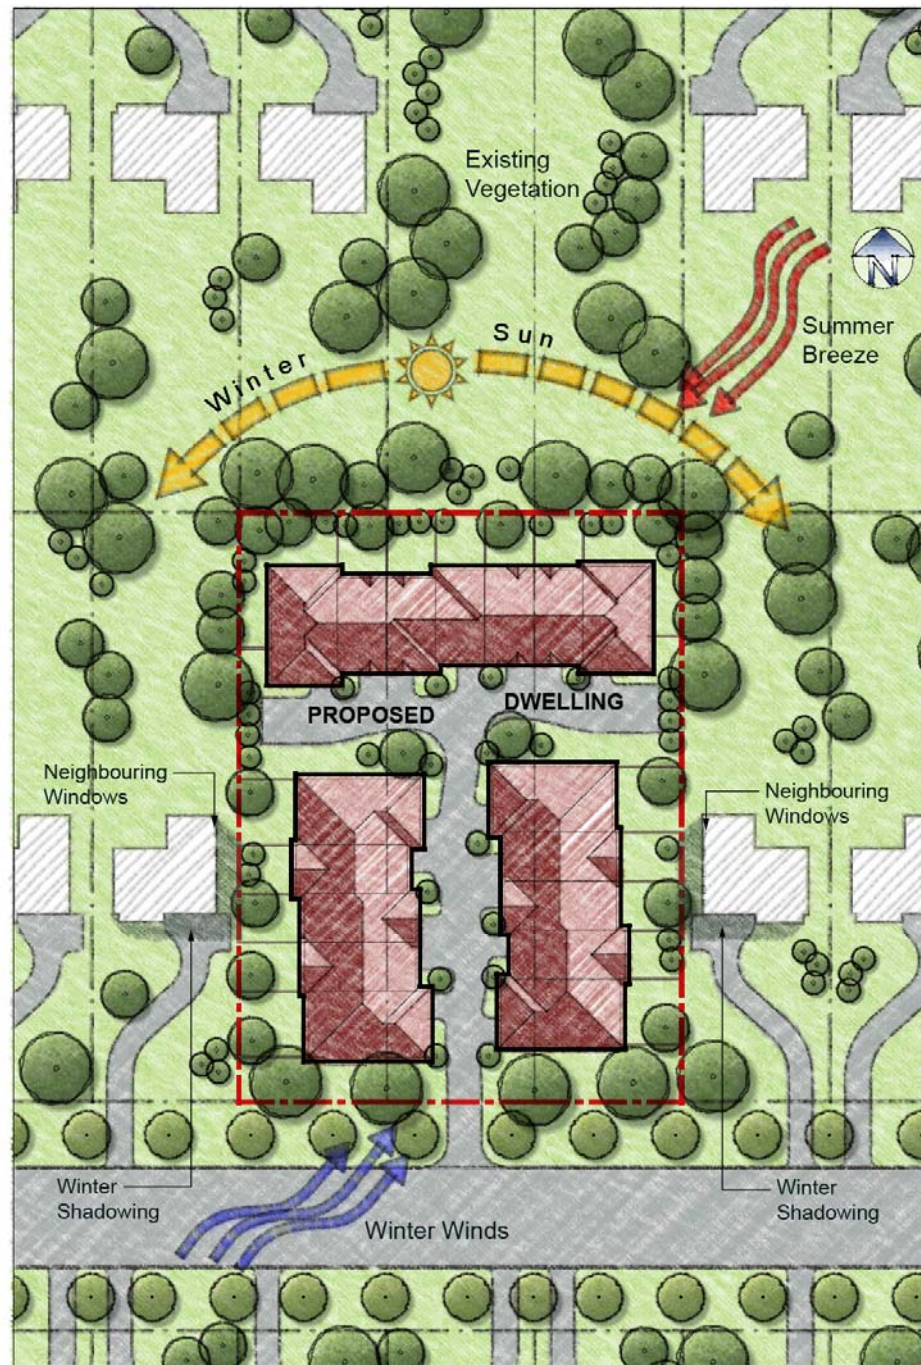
Site Analysis Plan for Multi Dwelling Housing
